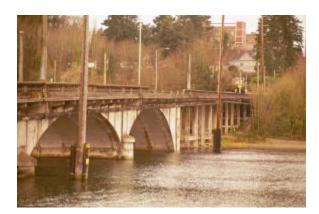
Collapsed Railing on 4th Avenue Bridge
